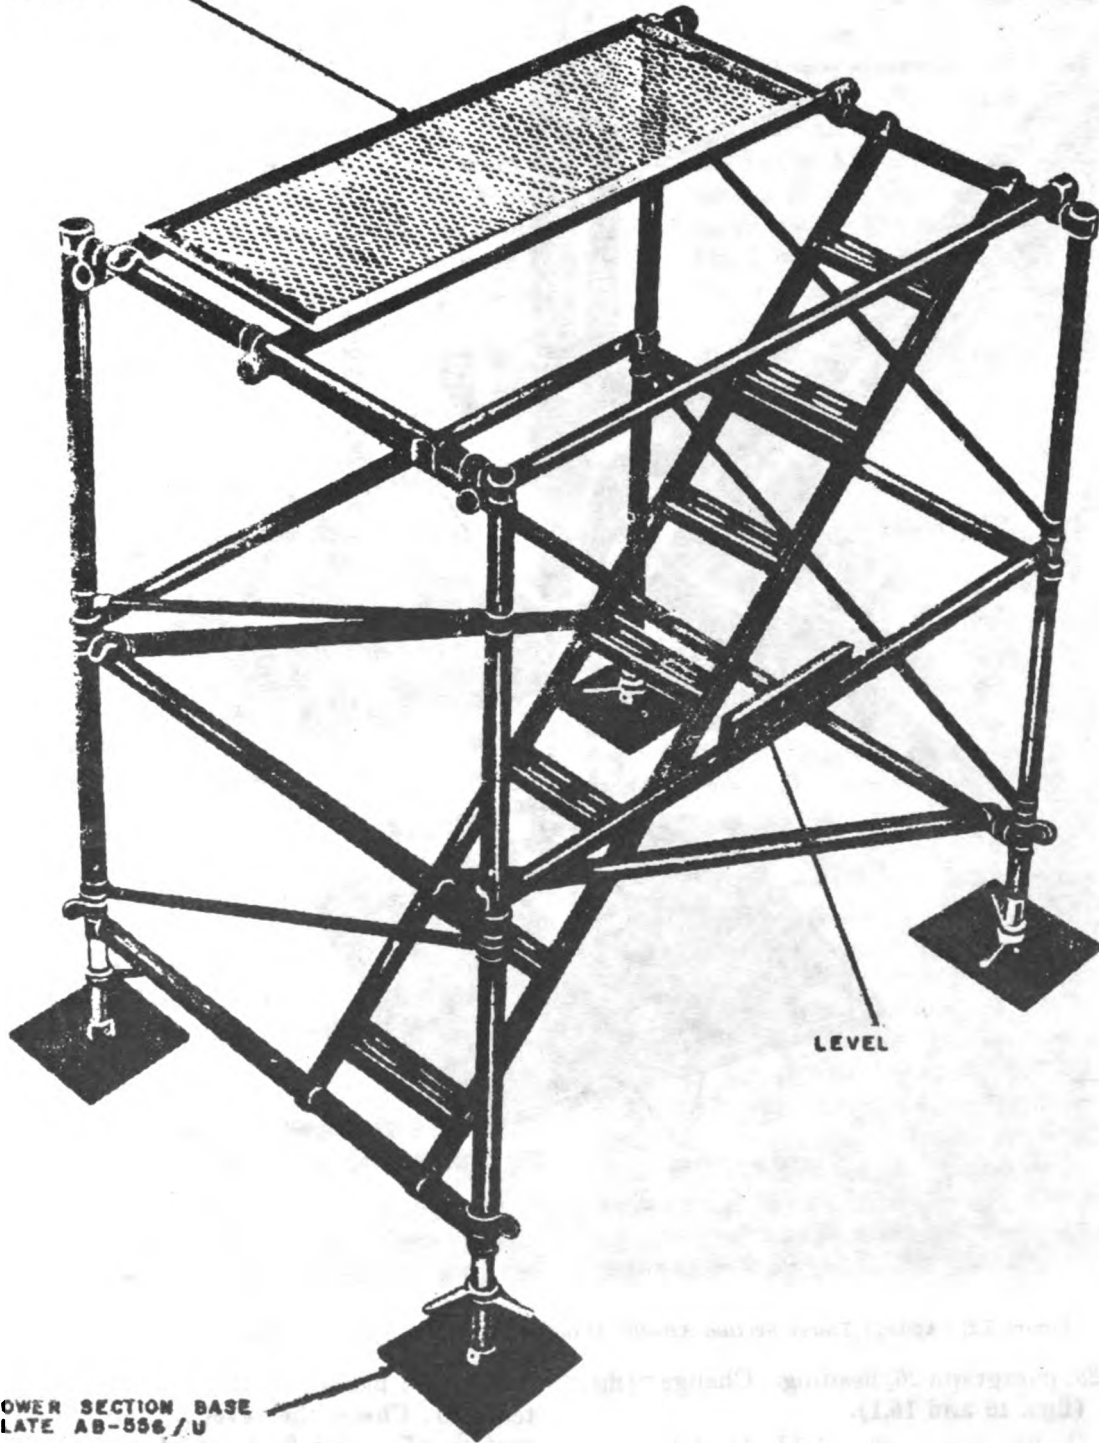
(Added) Tower Section Base Plate AB-556/U.
